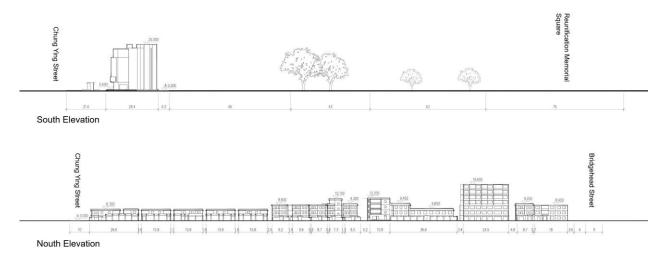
Elevation of the Street Walls of Leisure Streets (Source: Drawn by the Author)
